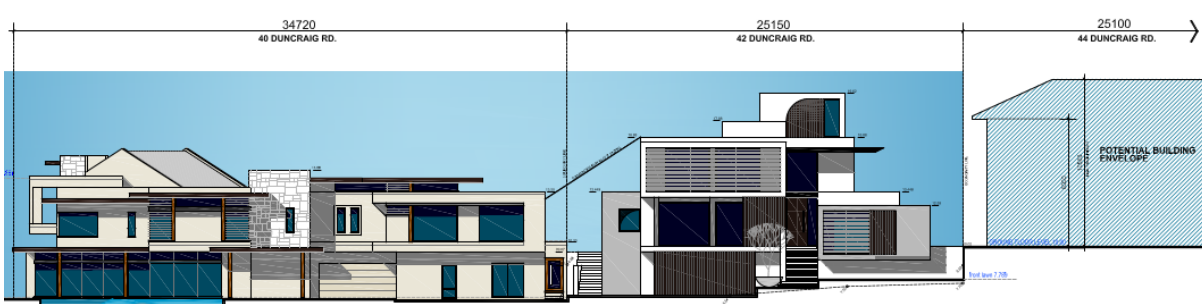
DunCraig Road streetscape with permitted building heights on the adjoining vacant site at 44 DunCraig Road
